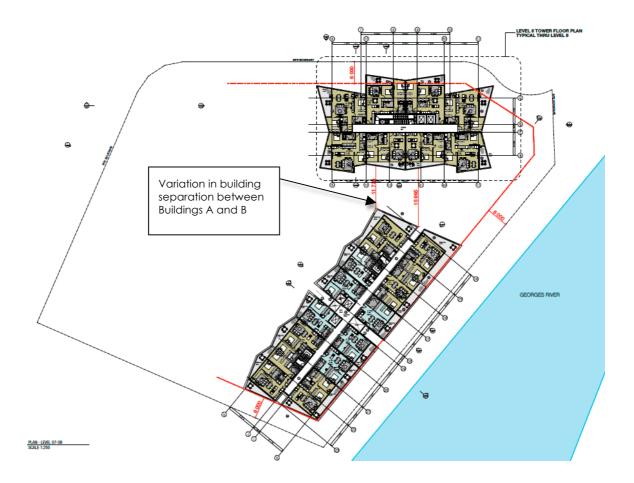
Floor plan of Levels 7 and 8, illustrating the areas of non-compliance Source: Woods Bagot
